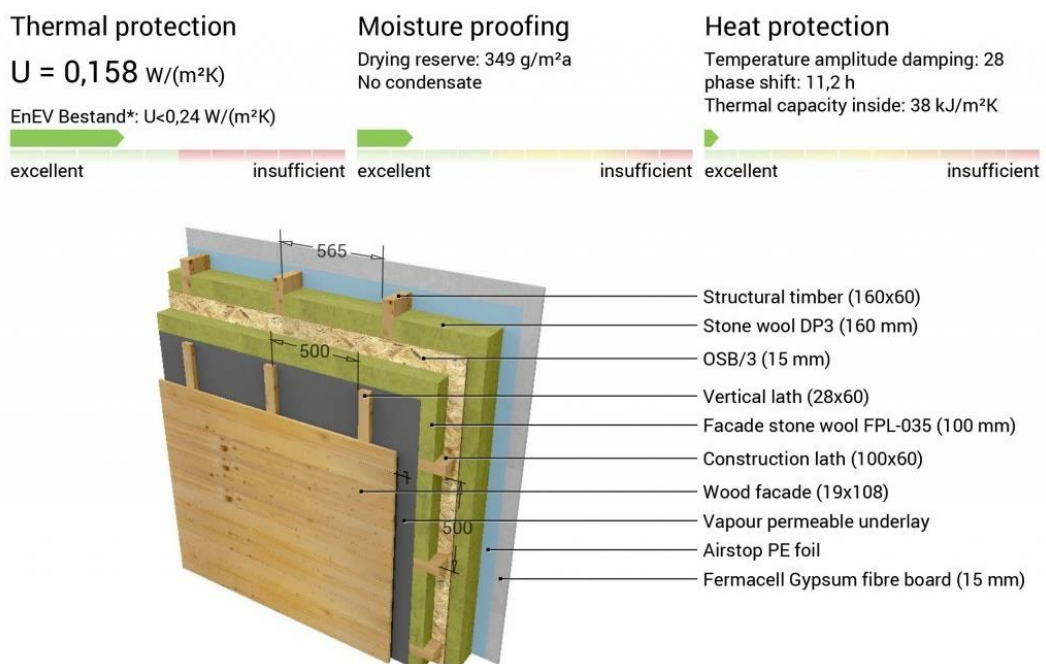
Steco centar external wall detail second example with thermal and heat protection values and moisture proofing.
